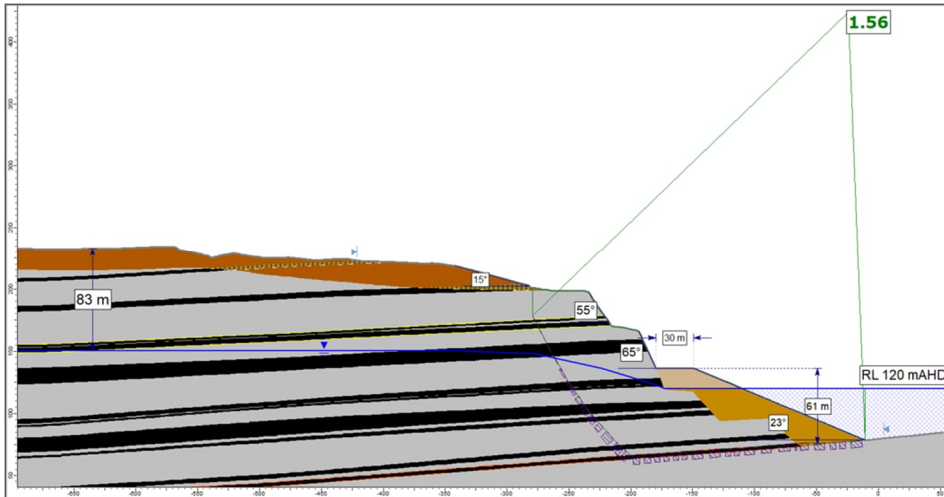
Slope stability model result for Section 2 (South) – West highwall.
